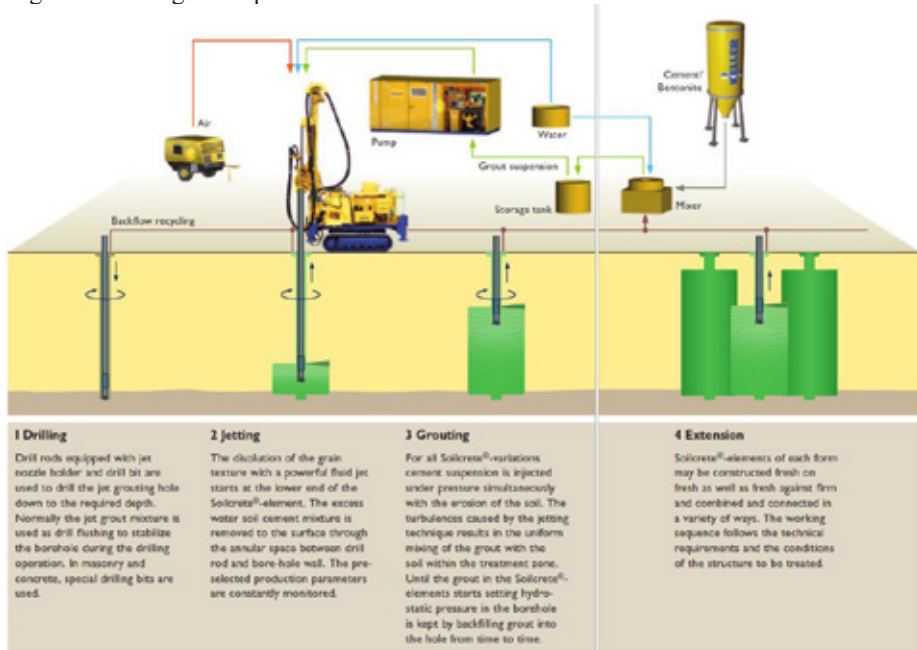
Soilcrete® Sequences and typical site setup of equipment depending on the applied Jet Grouting Process
